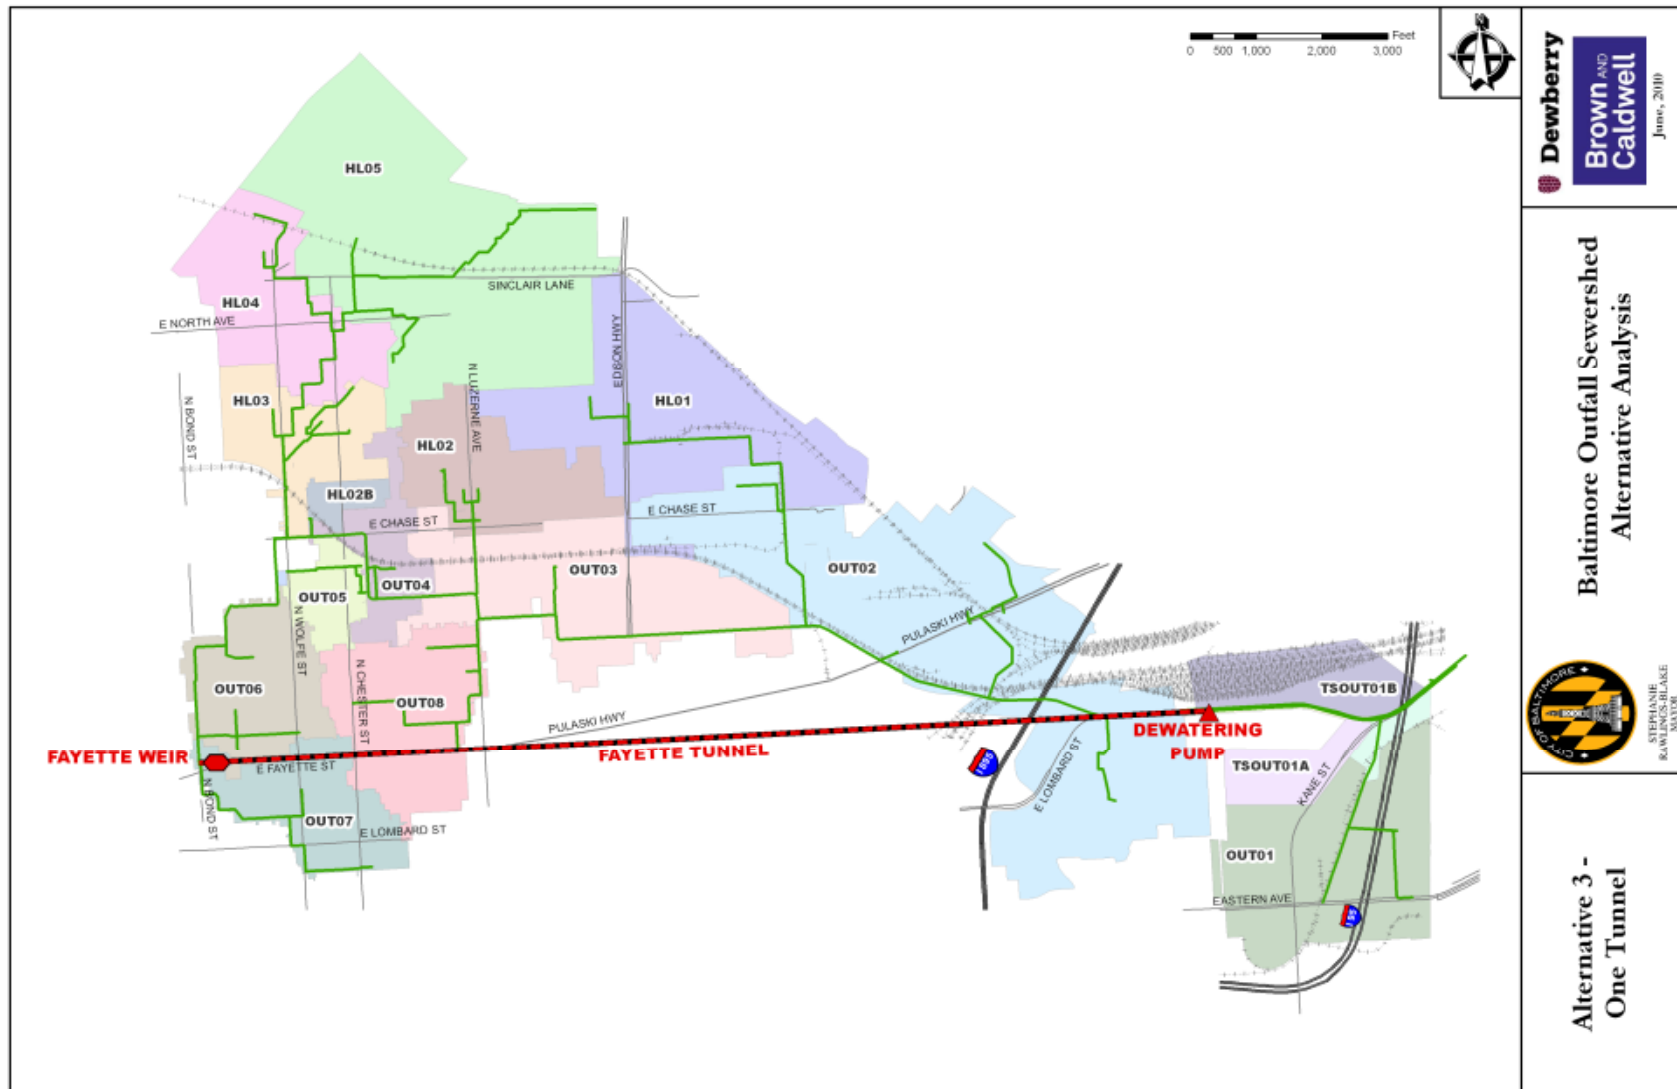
Alternative 3 Facilities: Storage/Conveyance Tunnel
